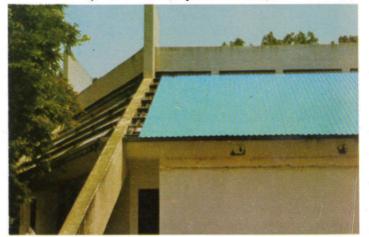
Umaru Shehu Lecture Theatre (Twin Lecture Theatre) by Niger Consultants, Ahmadu Bello University, Zaria. The same sloping roof slabs later covered with long span aluminium roofing sheets. Note the layout of the spacer rods and purlins. Source: Photograph by the authors (July 2011).
